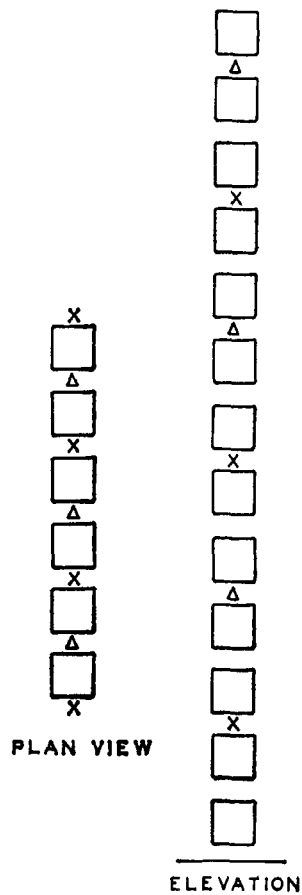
(a) In-Rack Sprinkler Arrangement, Single Row Racks, Height of Storage over 25 Ft (7.62 m).
